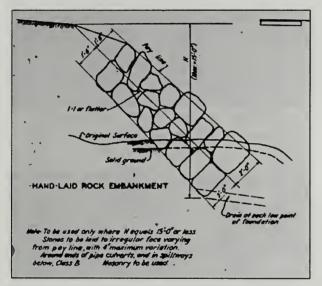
Detail of hand-laid rock embankment from Schooner Head Overlook Access Road, 1957. (U.S. Department of Commerce, Bureau of Public Roads, Project 22A1, Sheet 10 of 12, May 1957)
